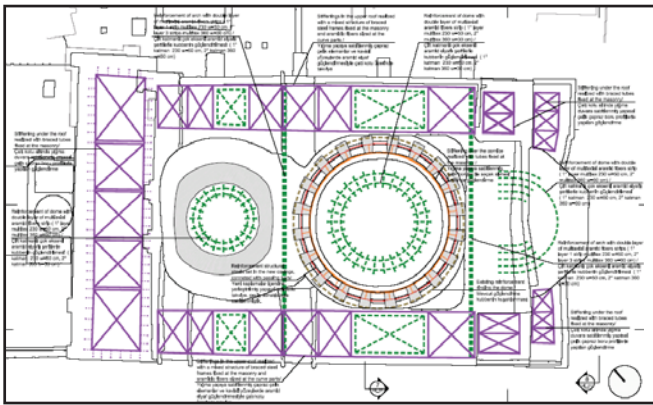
Stiffening bracing system over the lateral arches under the roof
